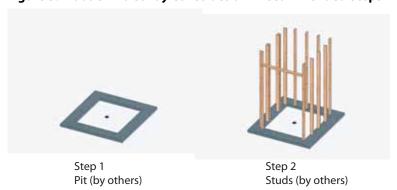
illustrates the recommended steps for constructing a wooden hoistway.
